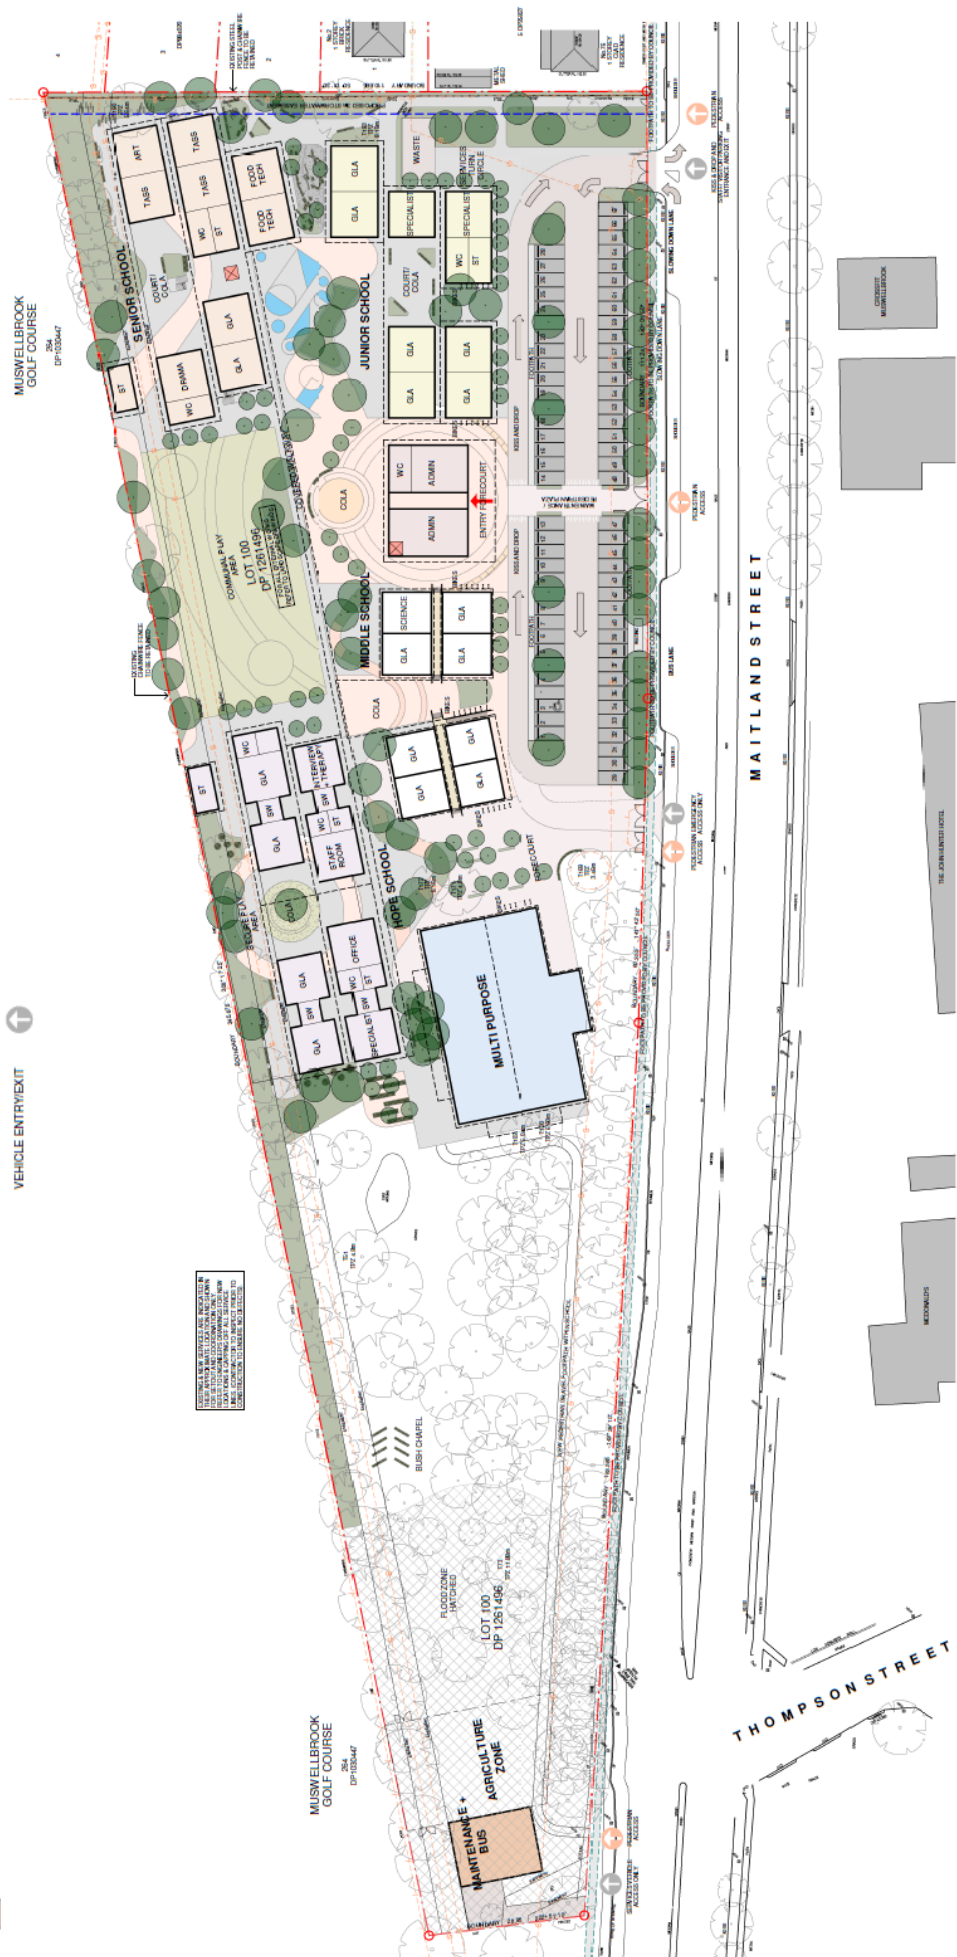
Ground Floor Concept Masterplan (NBRS-DR-A-SSDA-1000 Rev 13)
